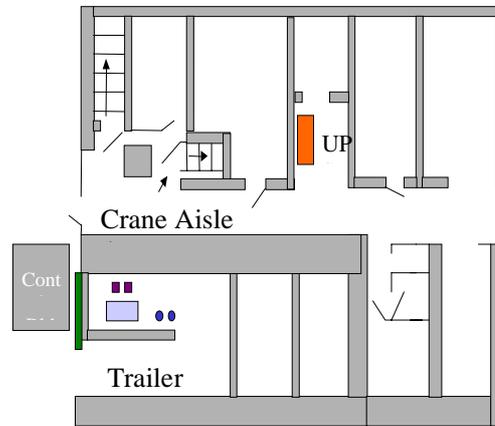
Layout of Pilot-Scale Melt-Dilute Facility.
